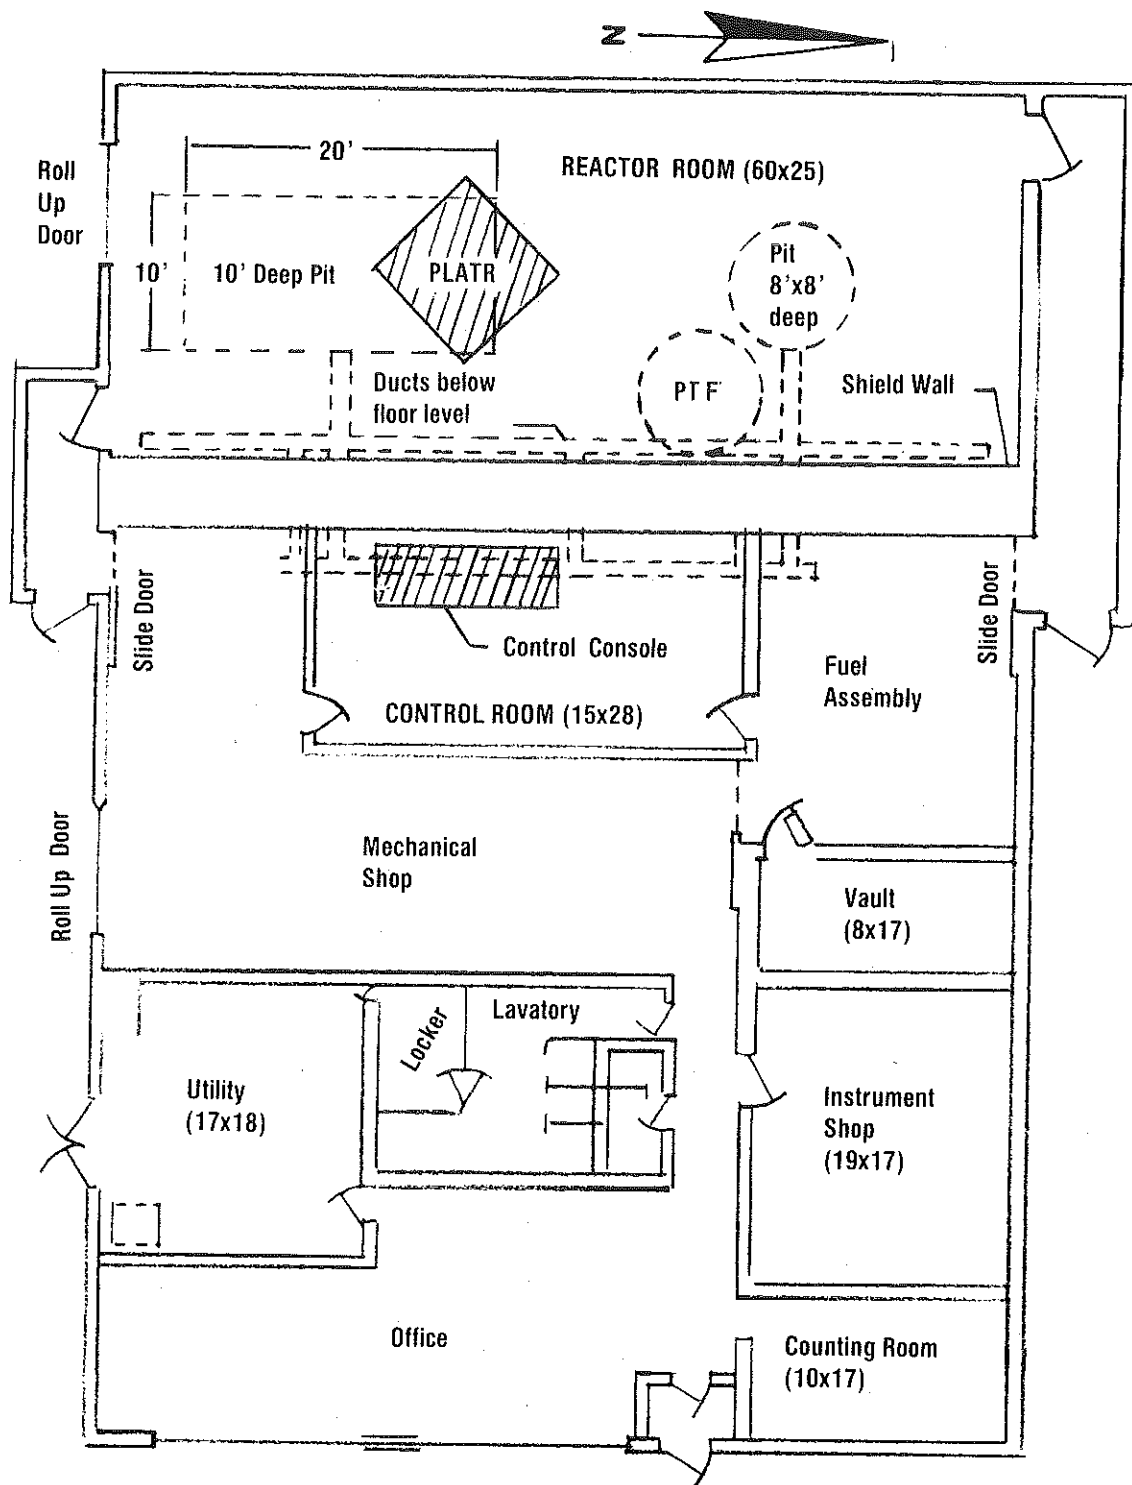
Critical Facility - Building Layout (April, 1967)
